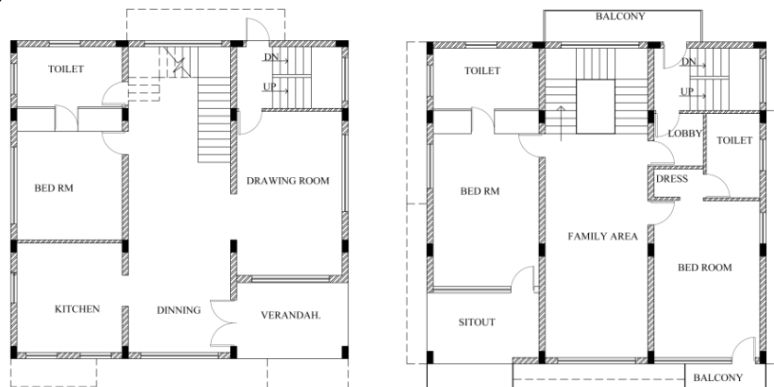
Ground Floor Plan Fig 2 First Floor Plan
